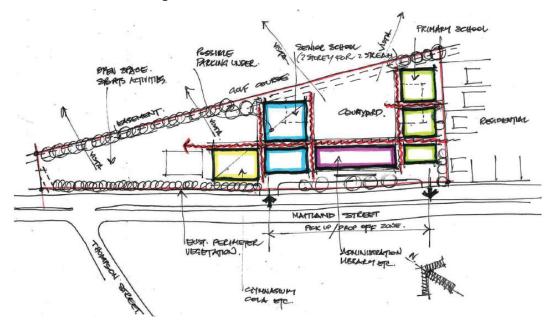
Preliminary Concept Plan A (source: NBRS Architecture)
